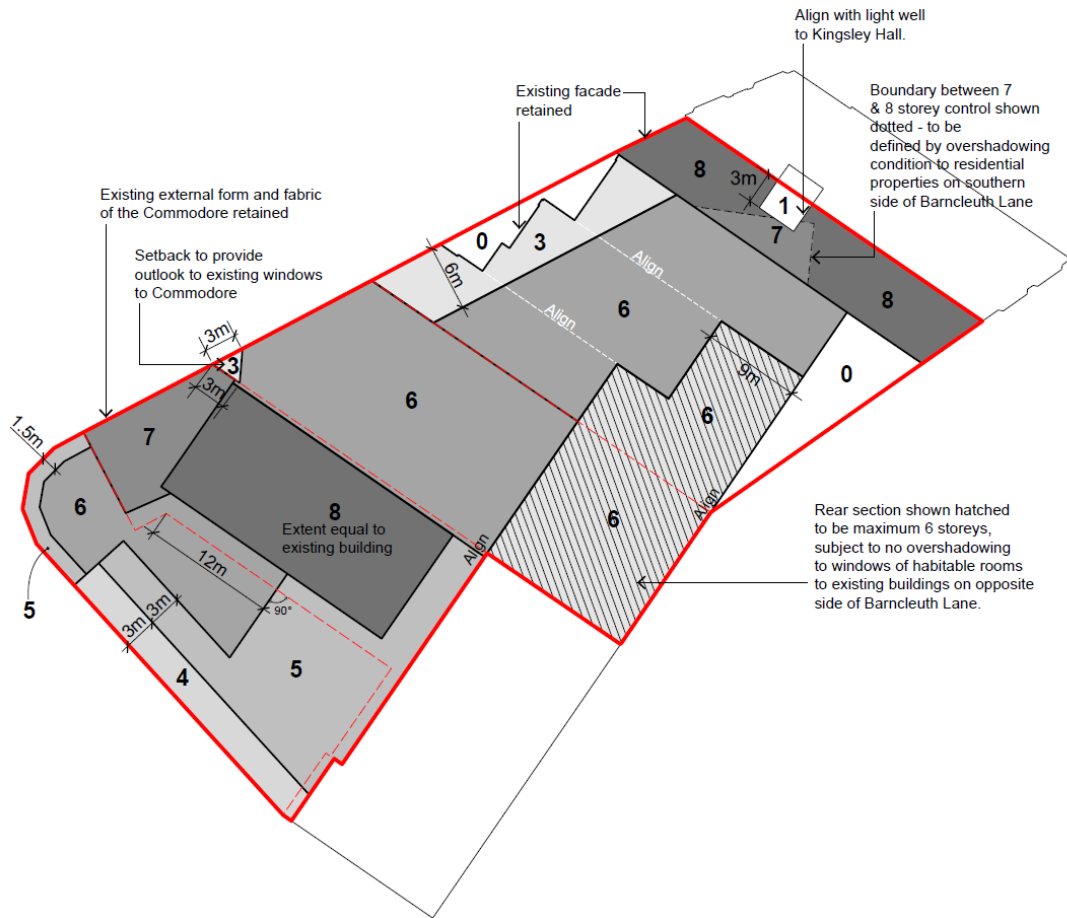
Building heights and setbacks plan (maximum heights noted in storeys)
